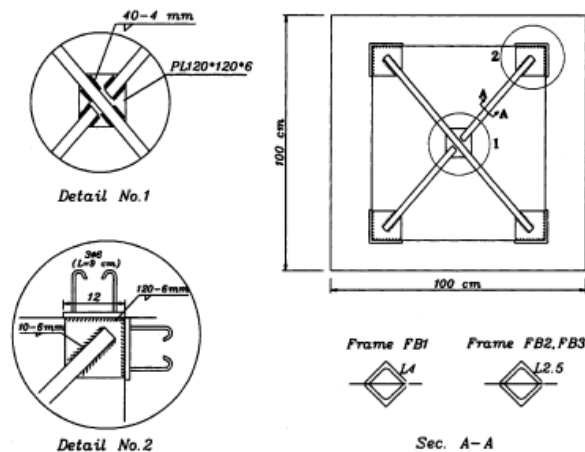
Detail of the X-bracing system and its connection to the RC frame
